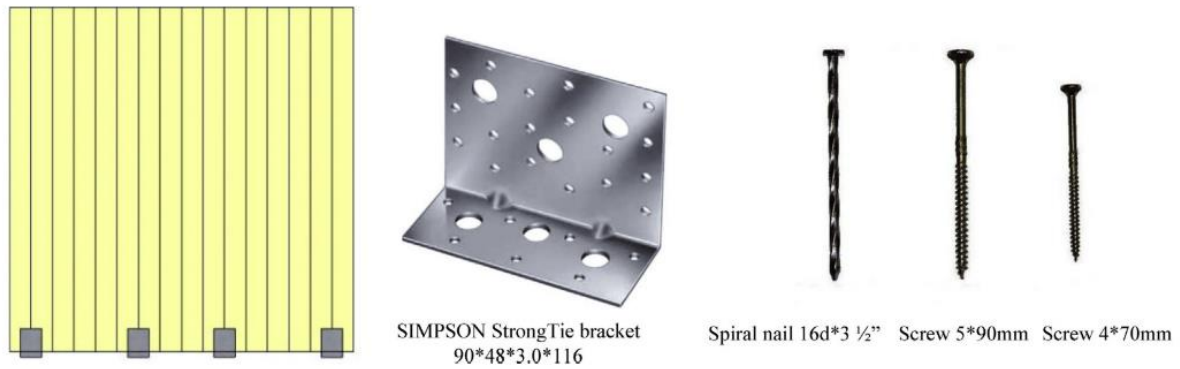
Tested wall and connection configuration from Shen et al. [149].
